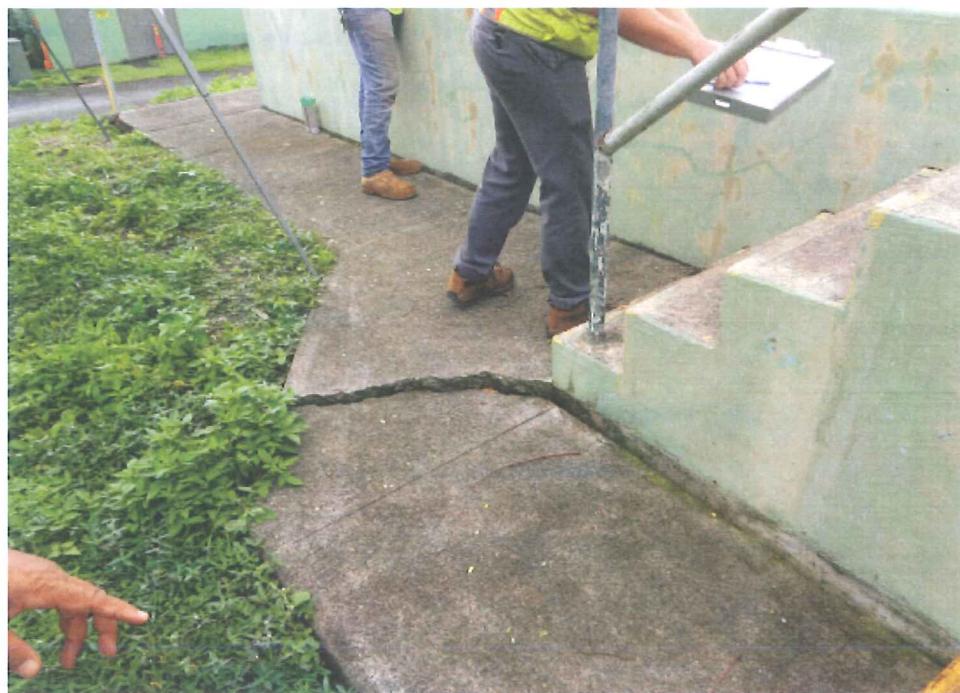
EAST VIEW. NOTE STEPS AND RAILING
